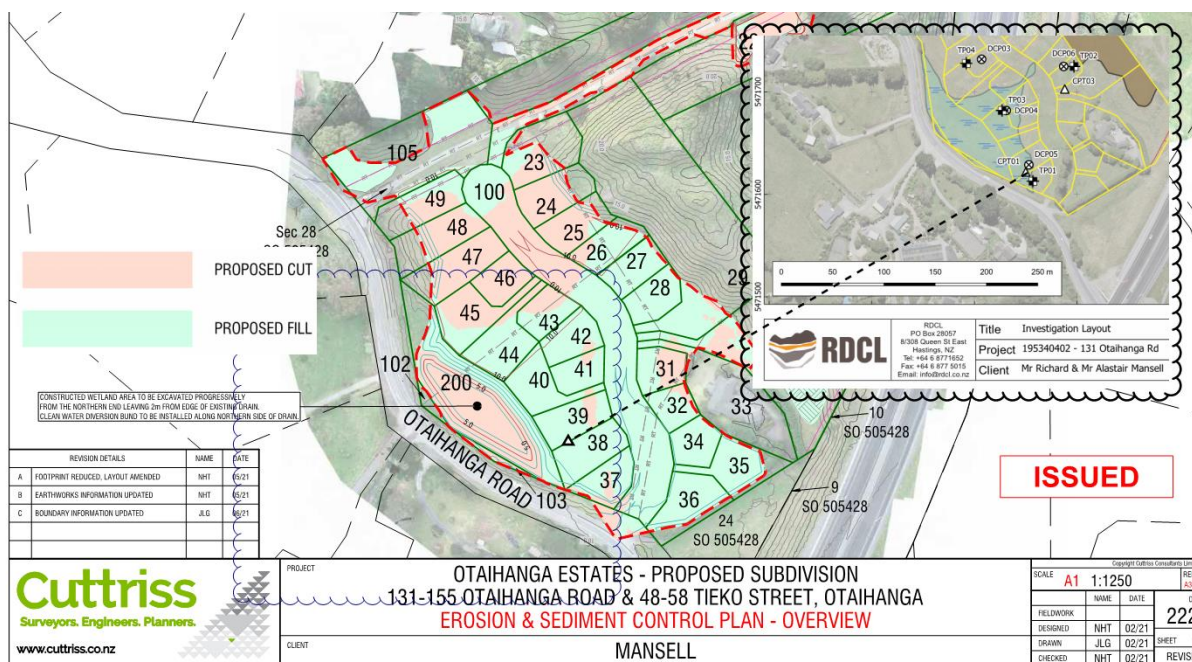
Extract from Cuttriss plan (scale as shown) showing the location CPT1
